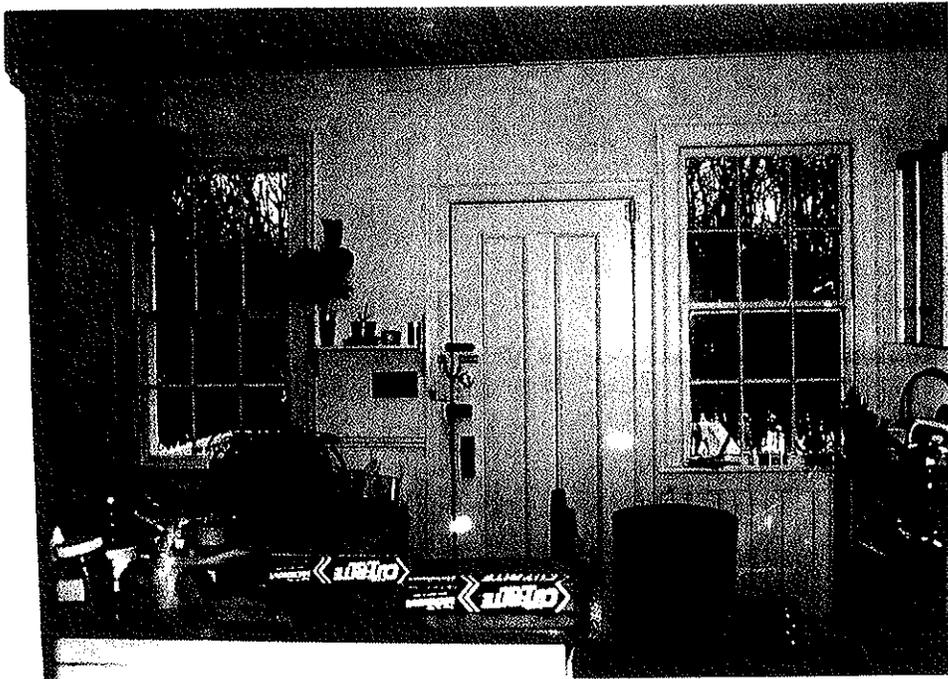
Weir House - Kitchen [Room 104], Looking West (1994).
